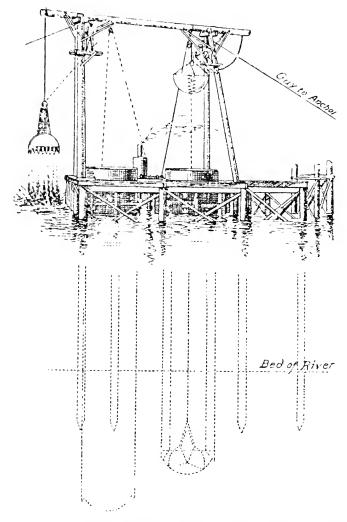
Elevation of Staging used when Sinking Cylinders, Sittang River Bridge.
